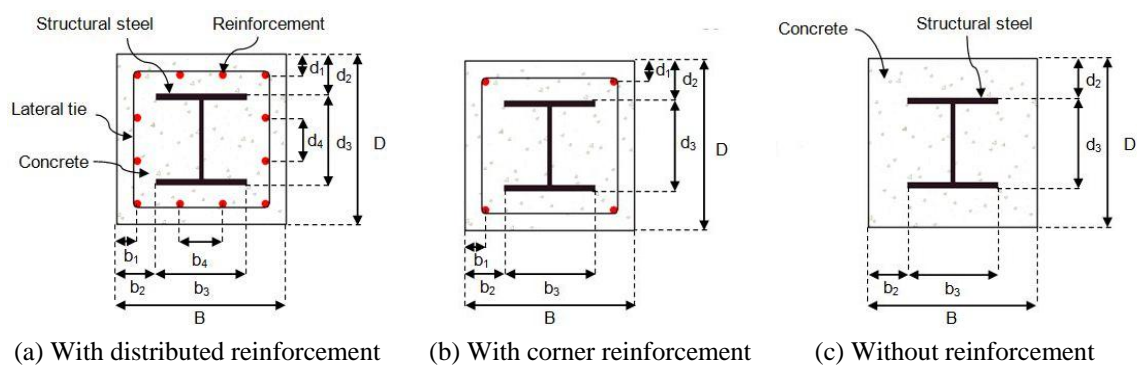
Cross-section configurations of concrete encased steel composite columns
